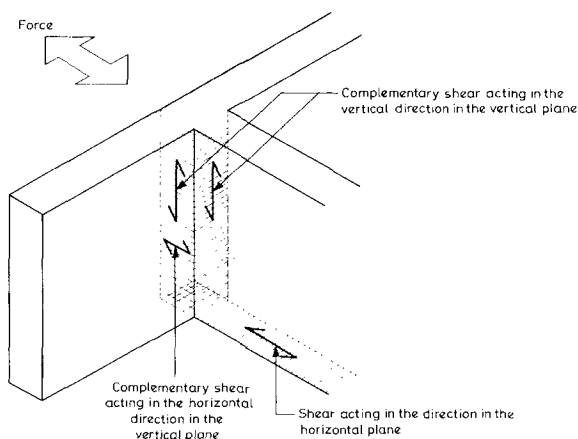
Shear forces acting in the horizontal and vertical planes
